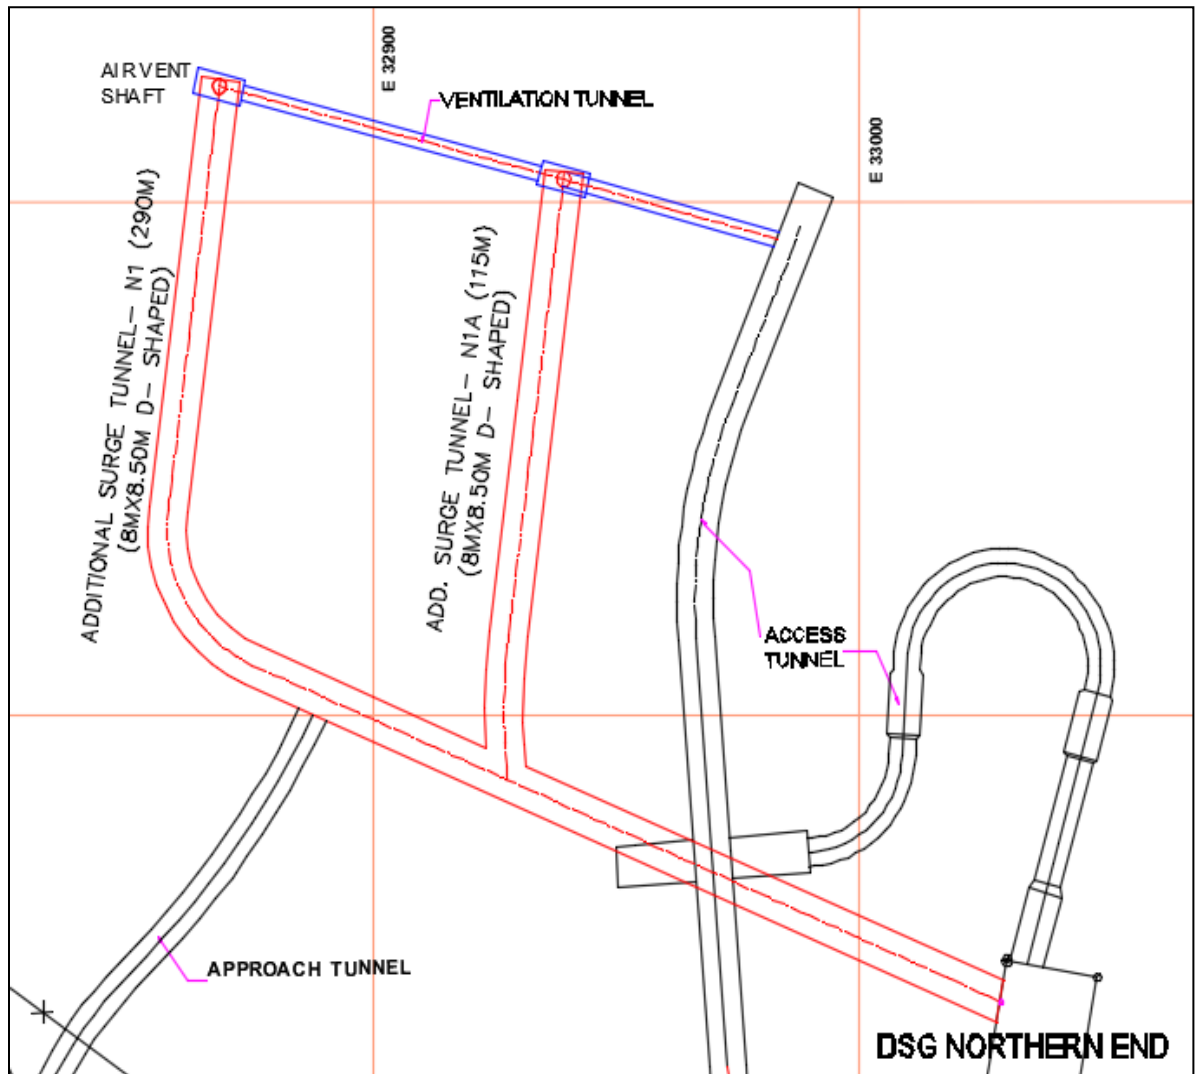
Additional Surge Tunnel Layout Plan AT DSG Northern End
